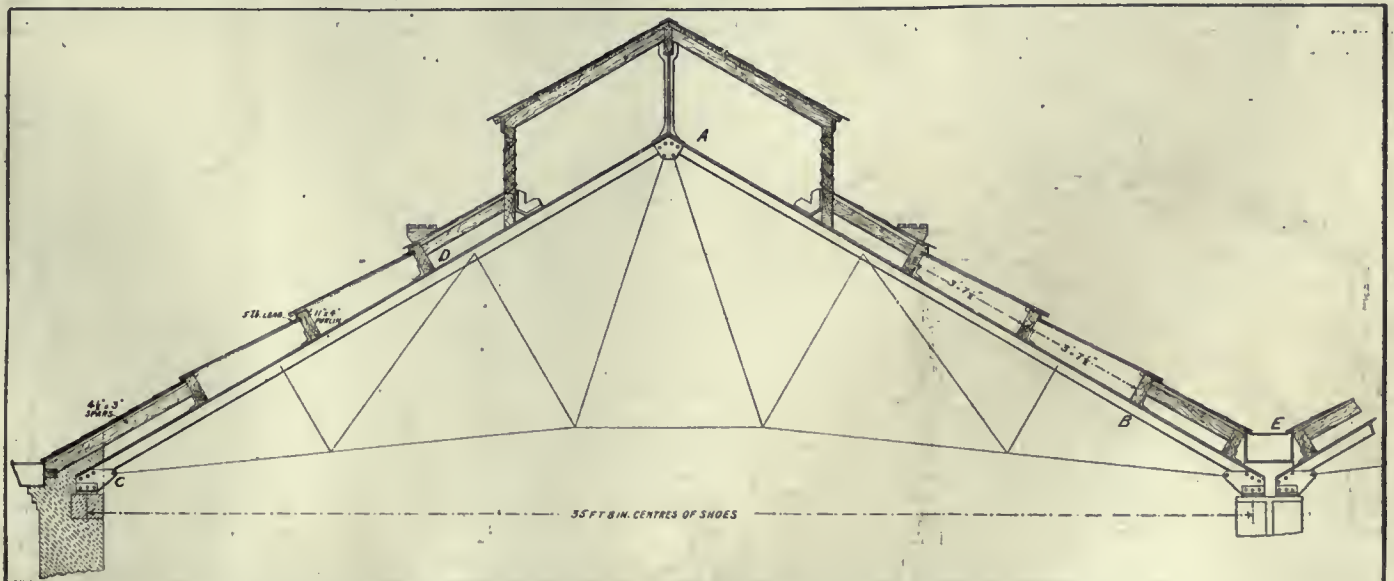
ROOF FOR STEEL FOUNDRY, LANCASHIRE & YORKSHIRE RY., HORWICH.
